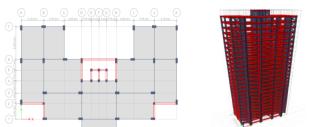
Dual system (Frame-Bracing) plan and structural Model
